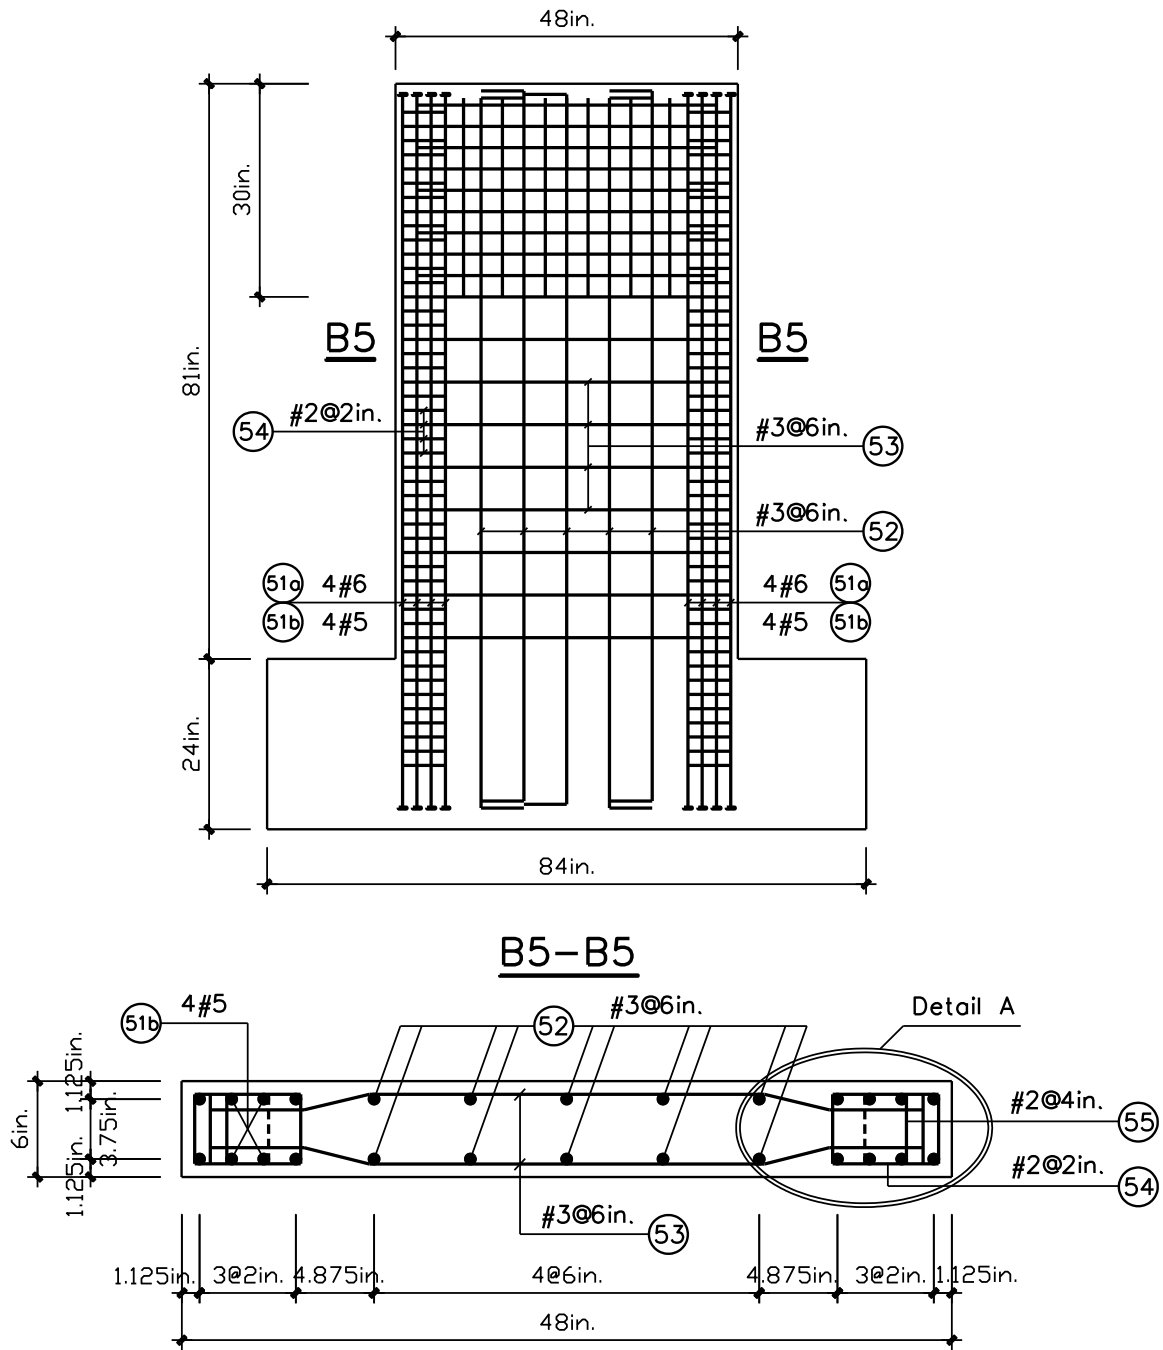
Reinforcement details for RW-A15-P2.5-S64
